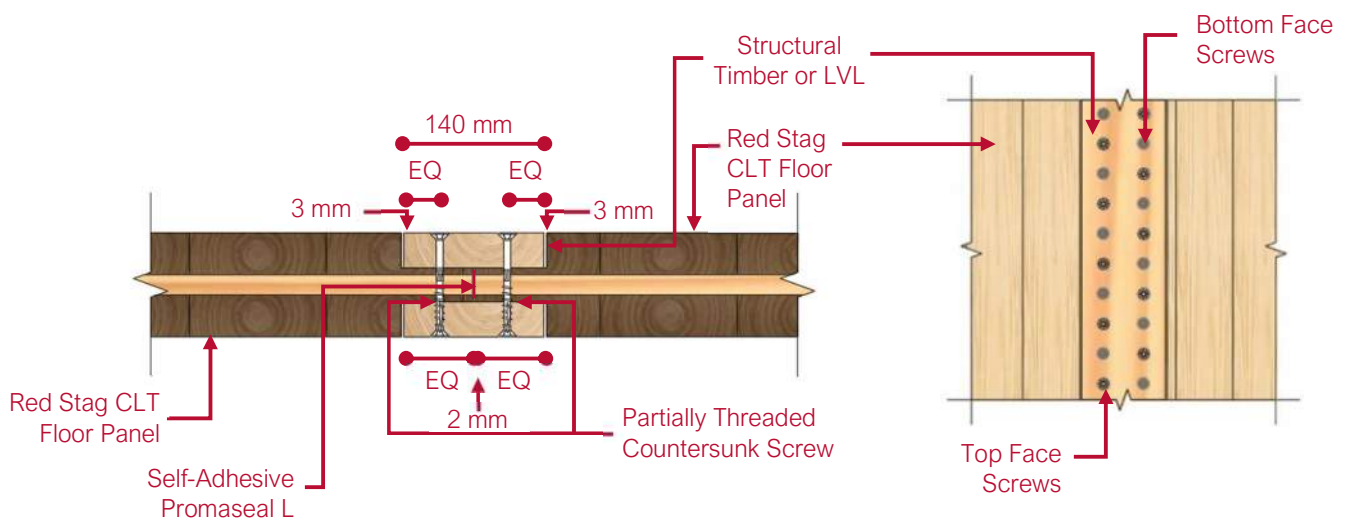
Red Stag three (3) layer CLT floor panel to floor panel with double spline plate connection.
